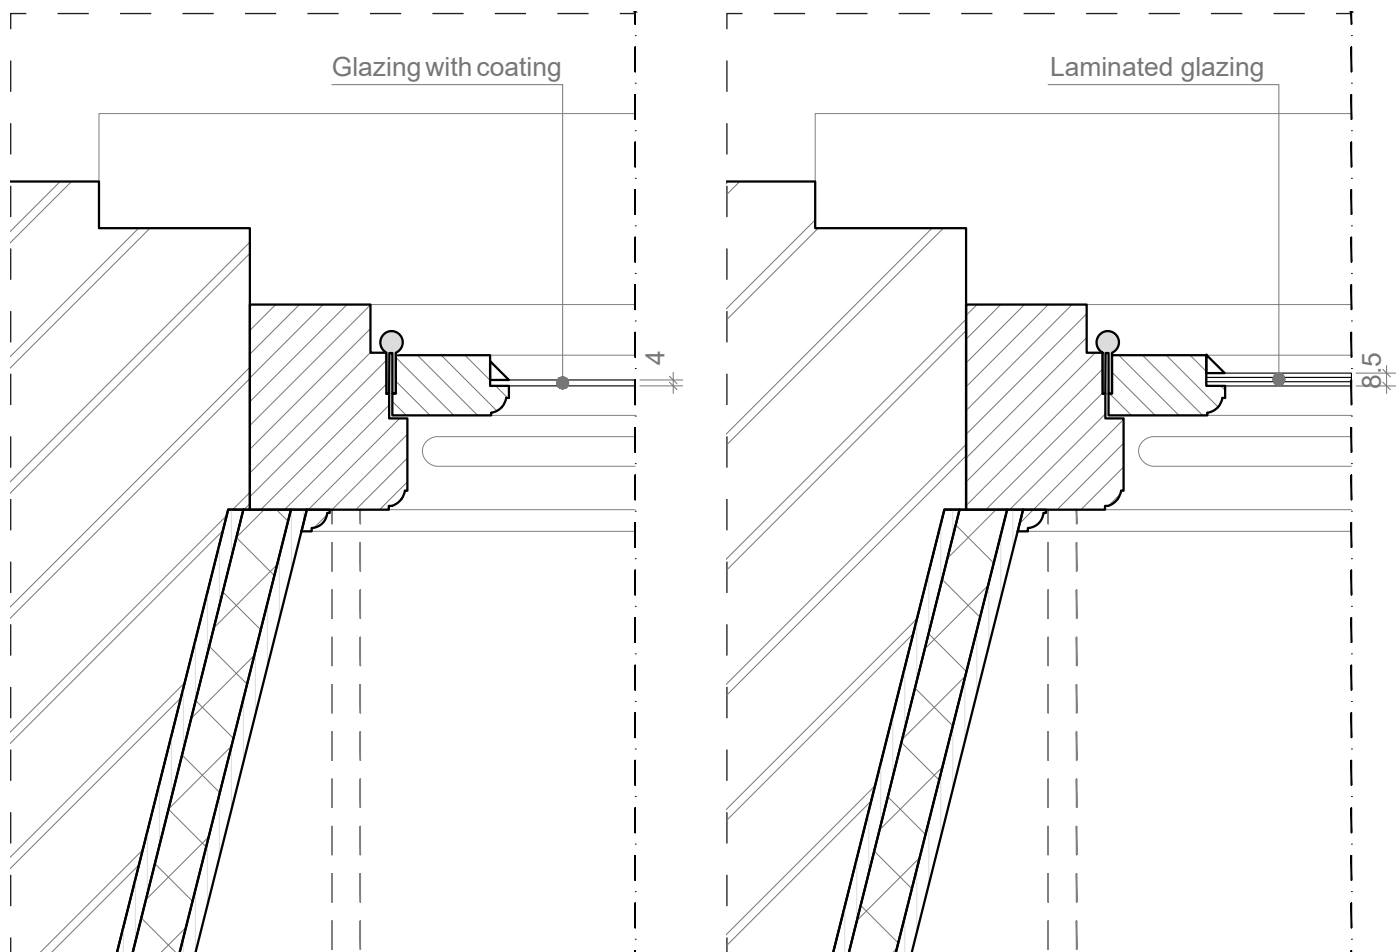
Details after renovation 1:5; a) Merk 04, type 1, b) Merk 04, type 2 (Author)
